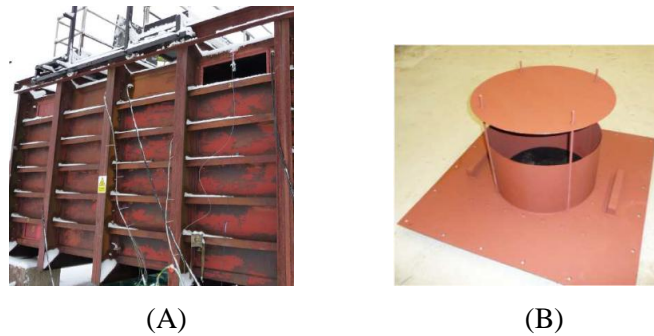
Picture a vertical ventilation opening (A) and of the roof chimney (B) [1].
